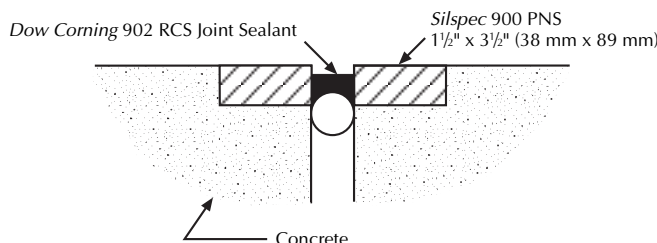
New Construction “T” Joint Repair or Elastomeric Joint Repair
